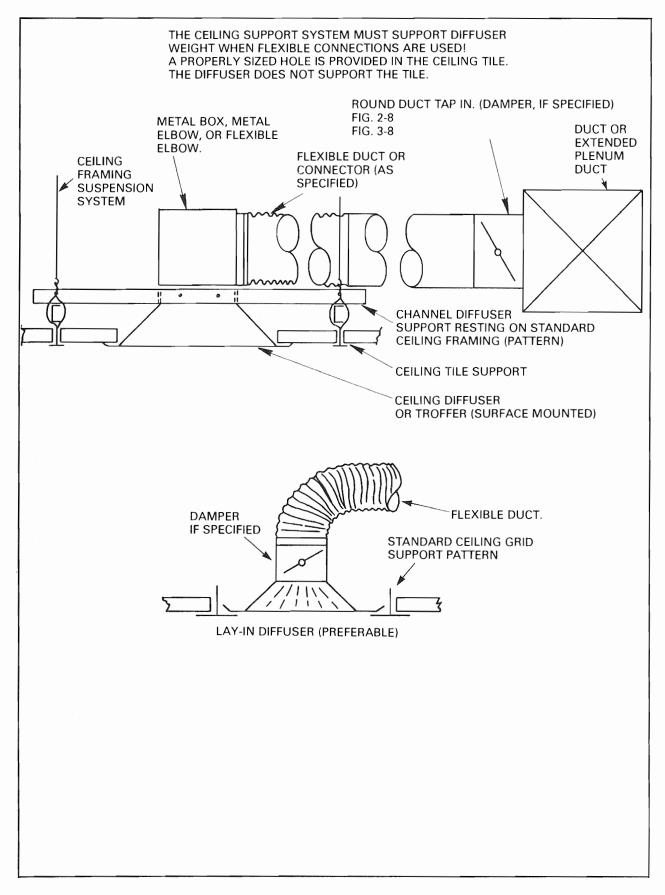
CEILING DIFFUSER BRANCH DUCTS
